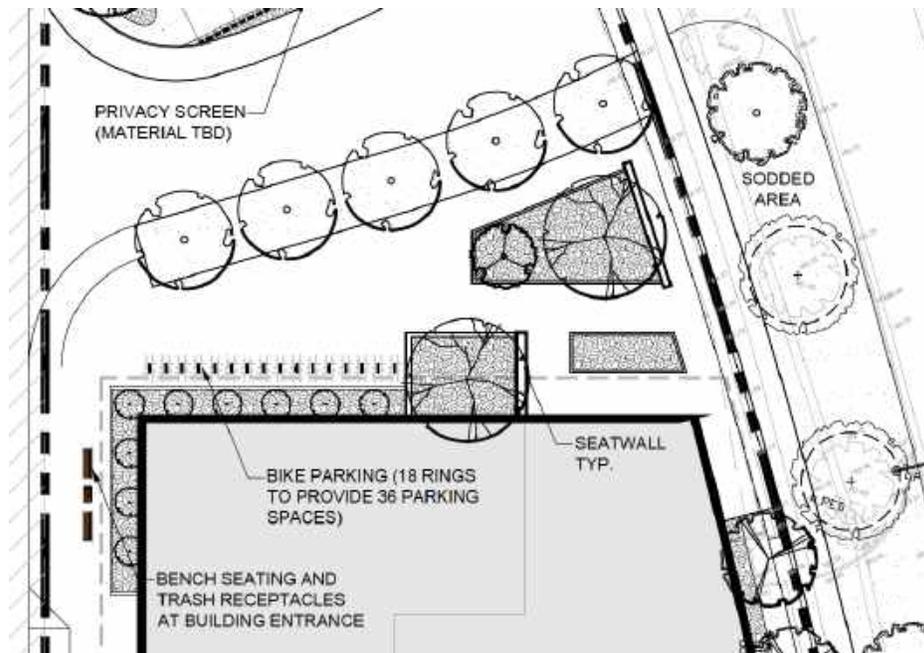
Mid-Block Gateway POPS Landscape Plan
